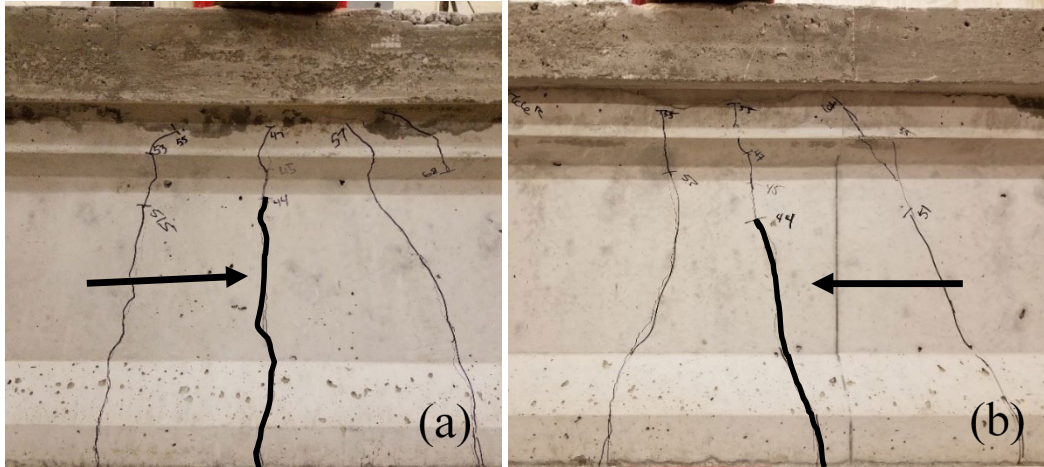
Initial flexural cracking under the load point on the RC2-N girder at 44 kips of load (a) and initial flexural cracking under the load point on the RC2-S girder at 44 kips of load (b). Arrows point to the dark lines that indicate the initial flexural cracks.
